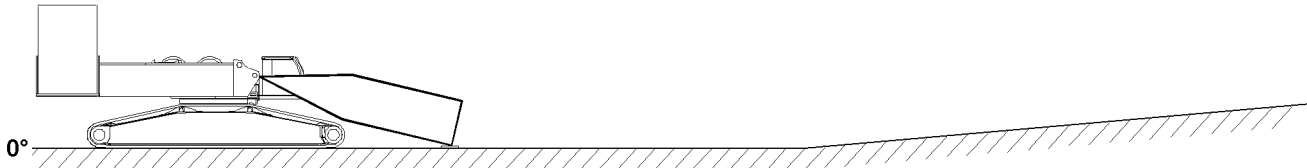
Disassembling and removing the boom - intermediate sections to the boom - pivot section
